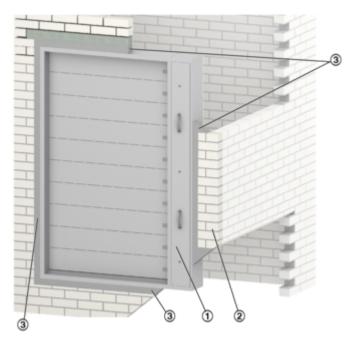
Installation example EK-JZ in solid shaft wall, installation type mortar-based
